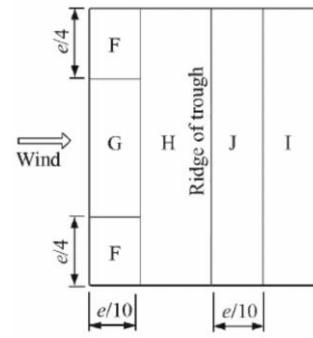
Loading zones of the walls and roof of the building when the wind acts normal to the long side of the building
